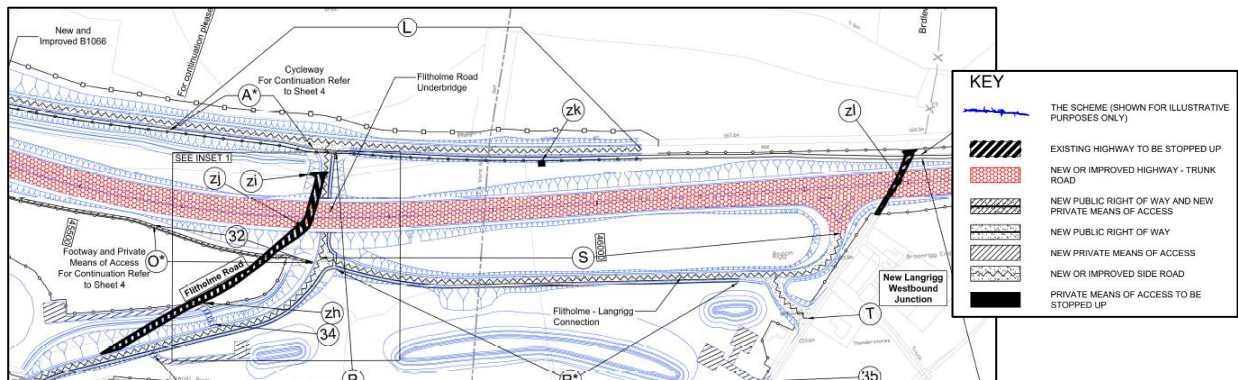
(e) Extract from Rights of Way and Access Plans (Before)
